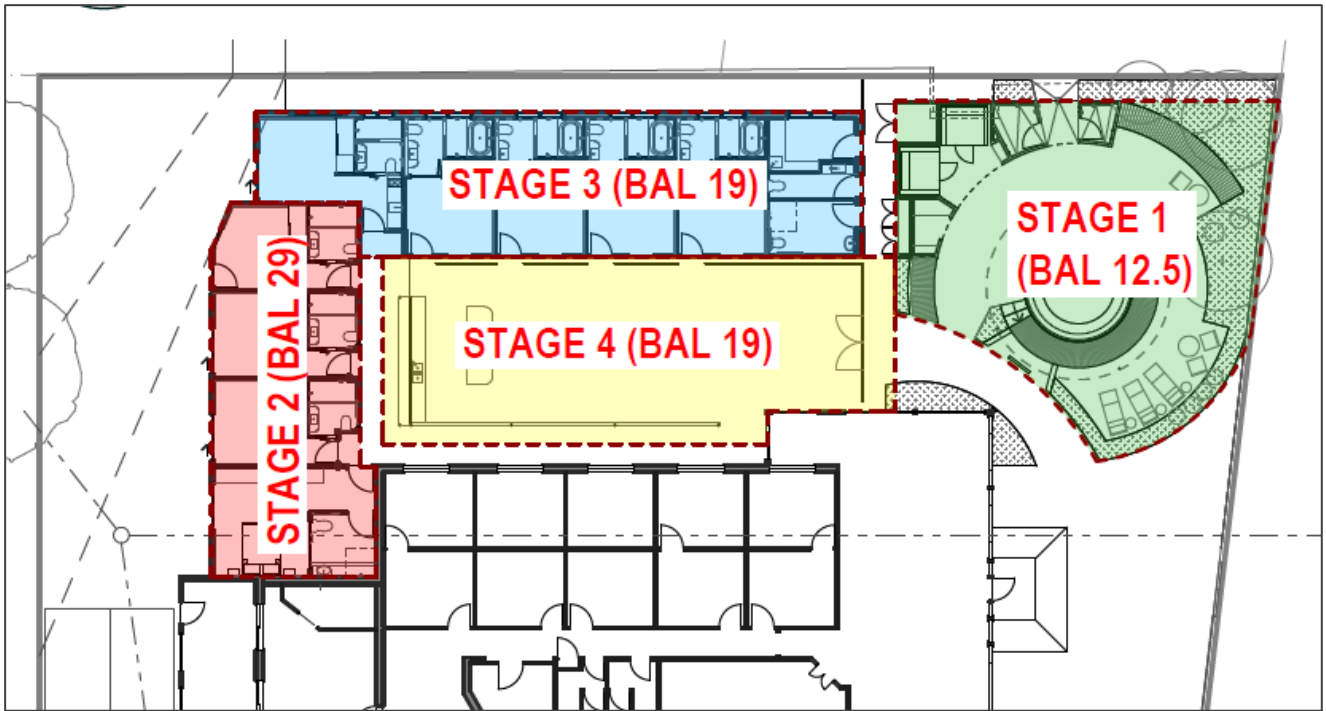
Previous required BAL construction (DA 10.2020.58.1)
